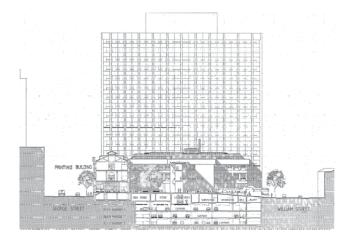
Section View of Printing Office with Executive Building in Background and Proposed Executive Building Annex and Car Park in Foregound, 1986
